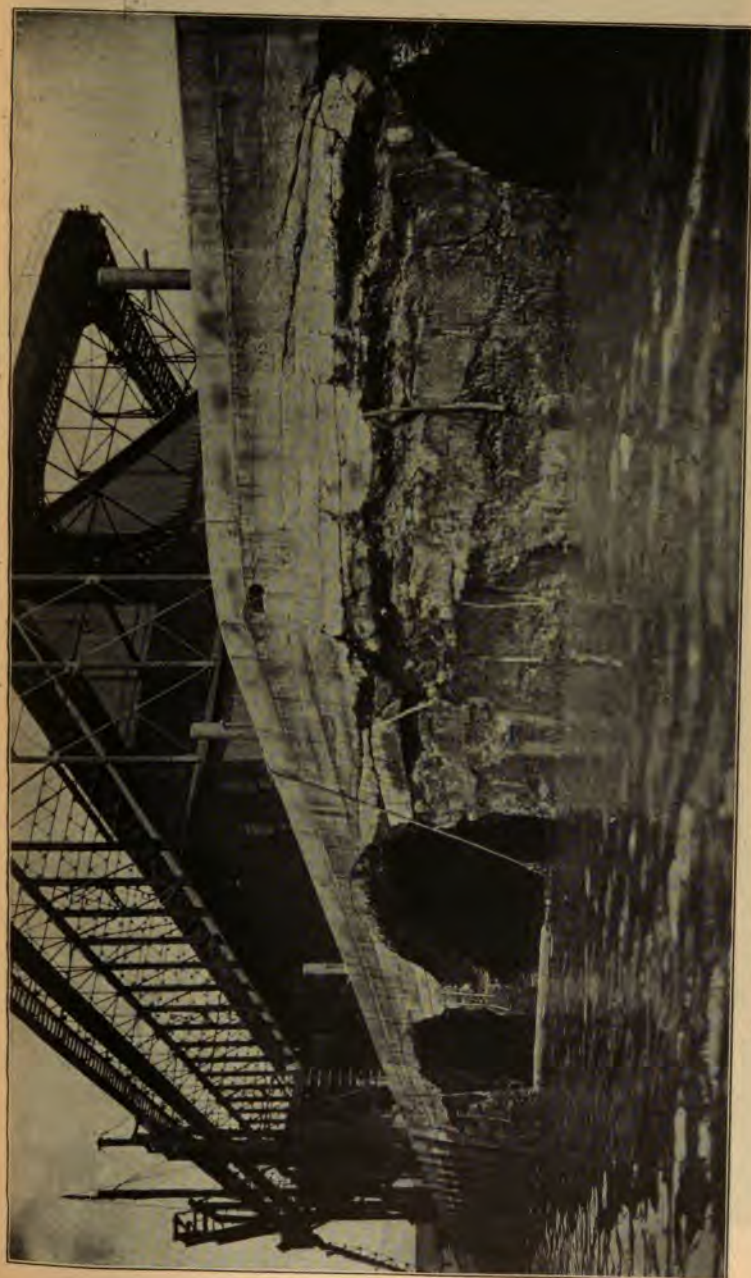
Charlestown Navy Yard, Concrete Masonry West Side of Pier No. 1.
